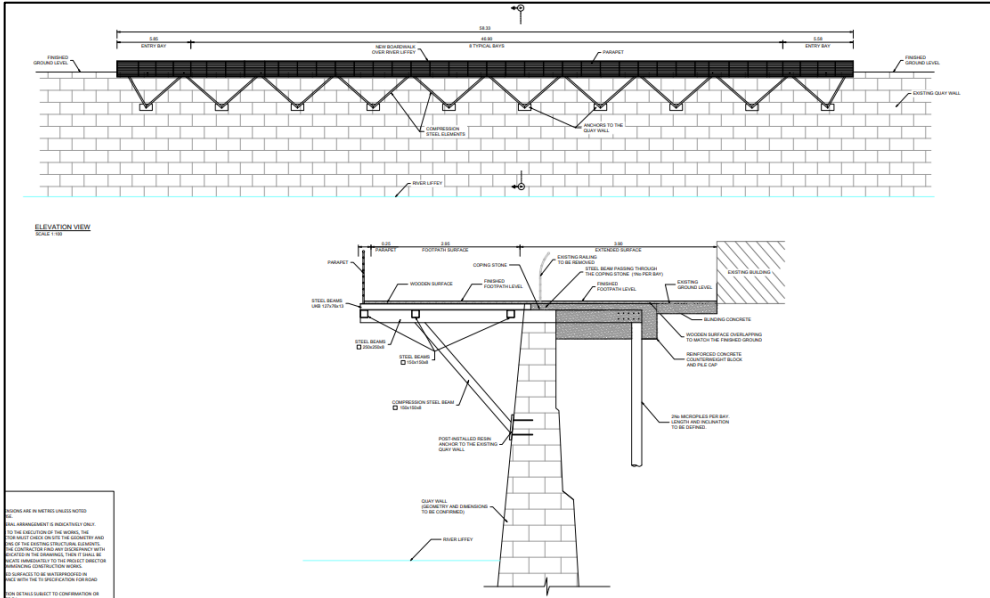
Elevation and sections of proposed boardwalk structure at Area C.
